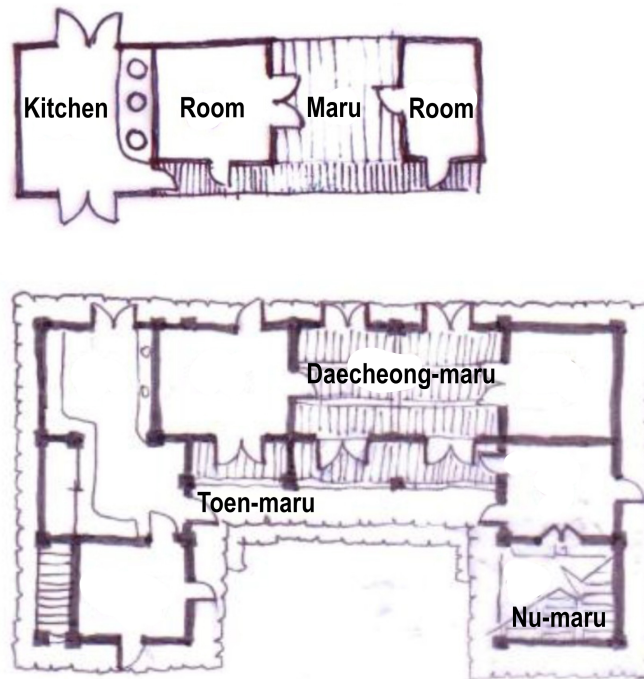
Basic floor plan of the Hanok (Up) and the Maru (Bottom)
